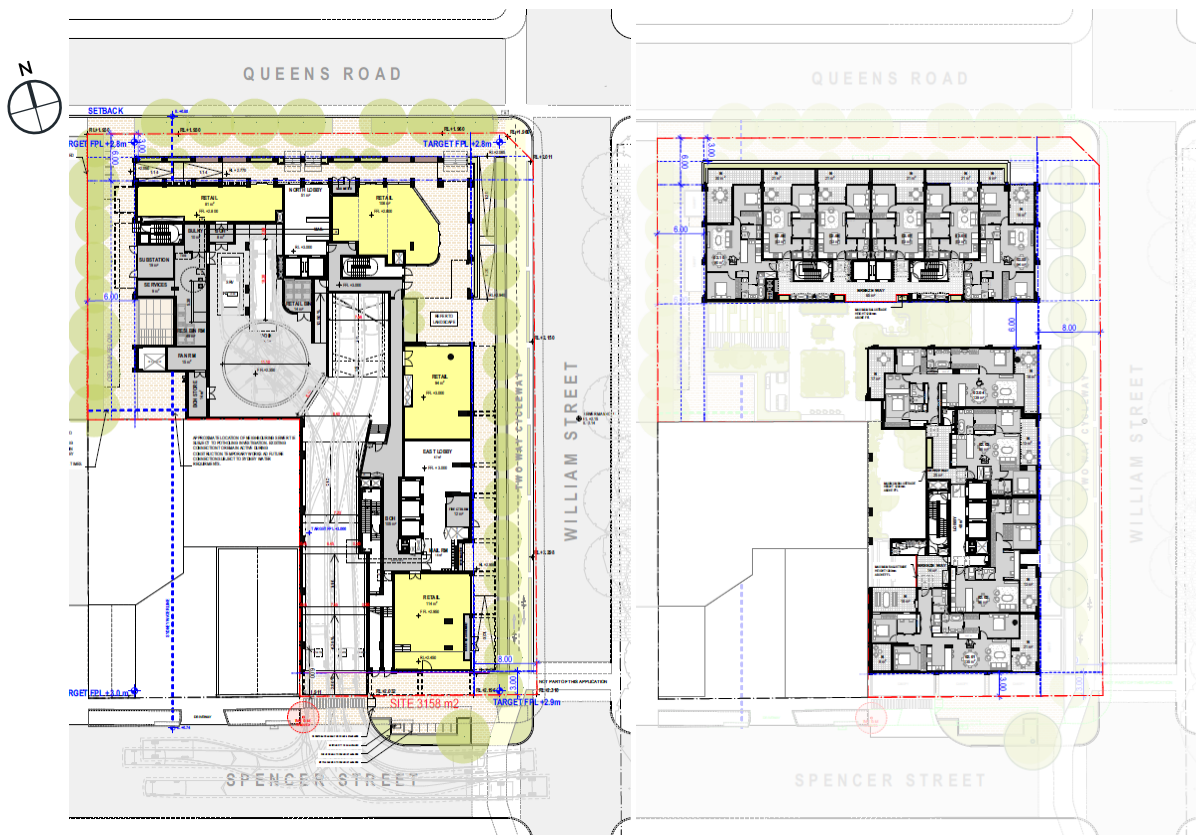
Ground floor (L) and Level 2 (R) plan of proposed development (Plus Studio, 2026)
